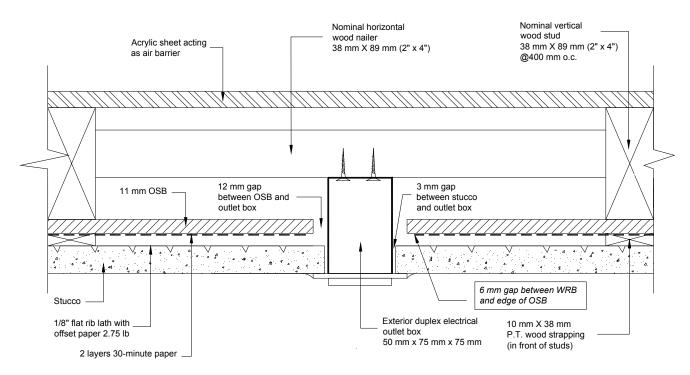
Wall/outlet box interface for specimen No. 5 –Horizontal section
